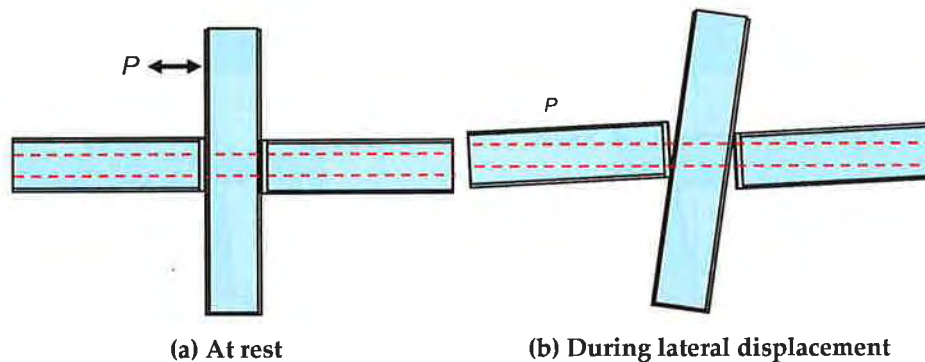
Post-tensioned beam-column joint, showing frame elongation.
